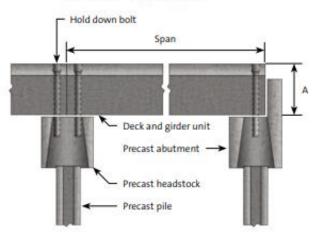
Cross-section detail of a complete HumeDeck® bridge system
